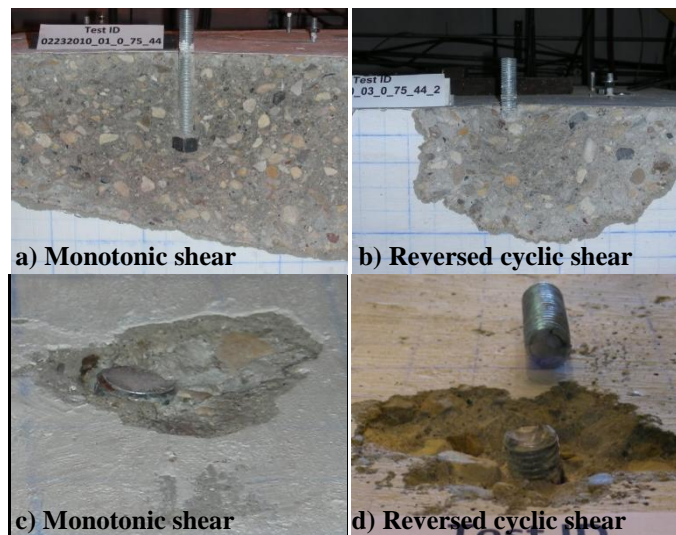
Typical failure modes of anchor bolts in shear
